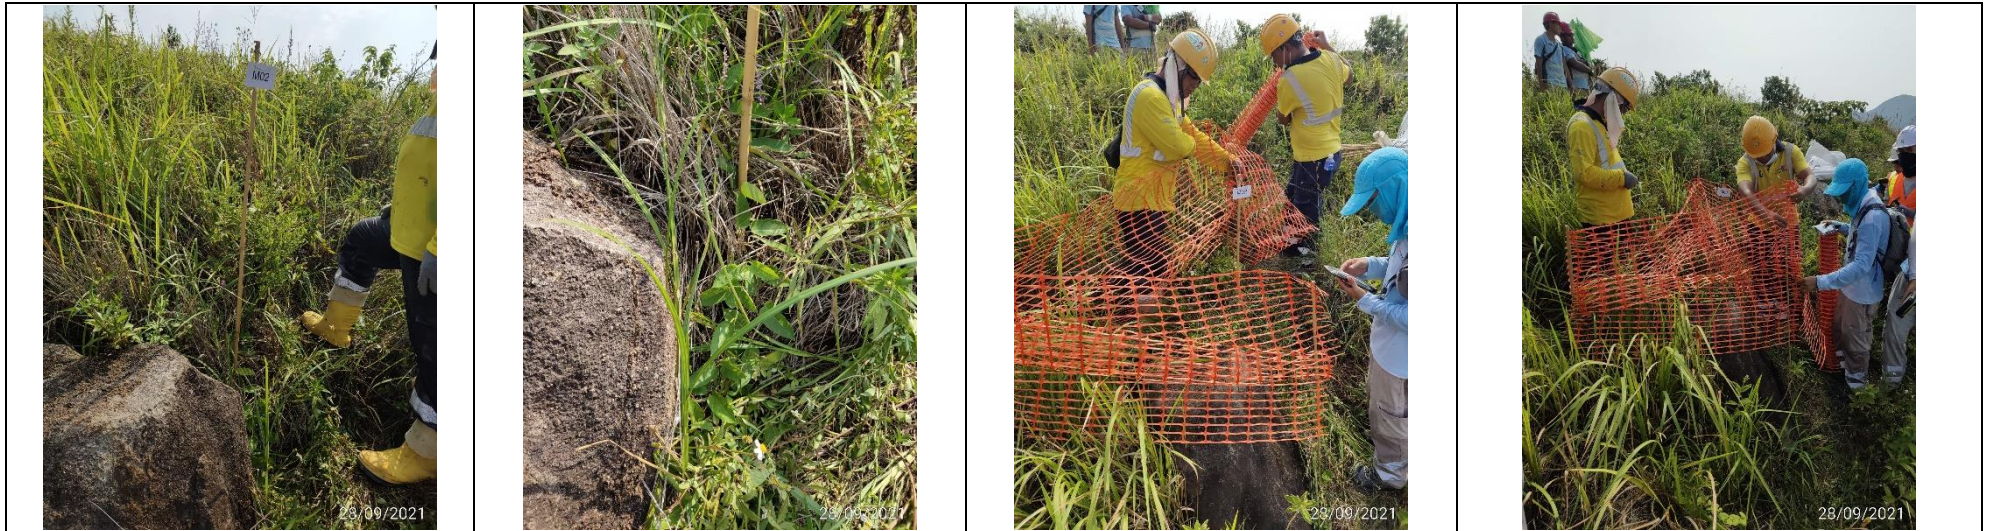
General view and habitat of the proposed Works Site and inspection access of boulder stabilization works.
